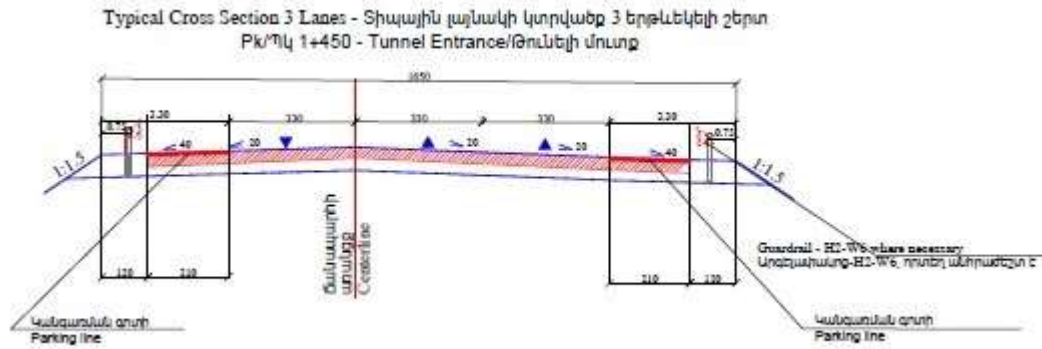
Typical Cross Section, PK 1+450, Entrance of the tunnel
